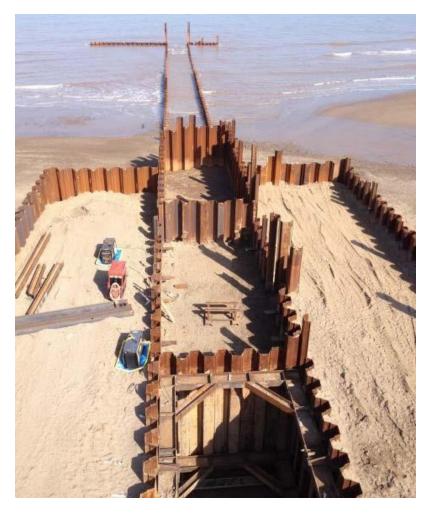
Example of an intertidal cofferdam installed using sheet piles. (courtesy of RWE renewables UK Ltd).
